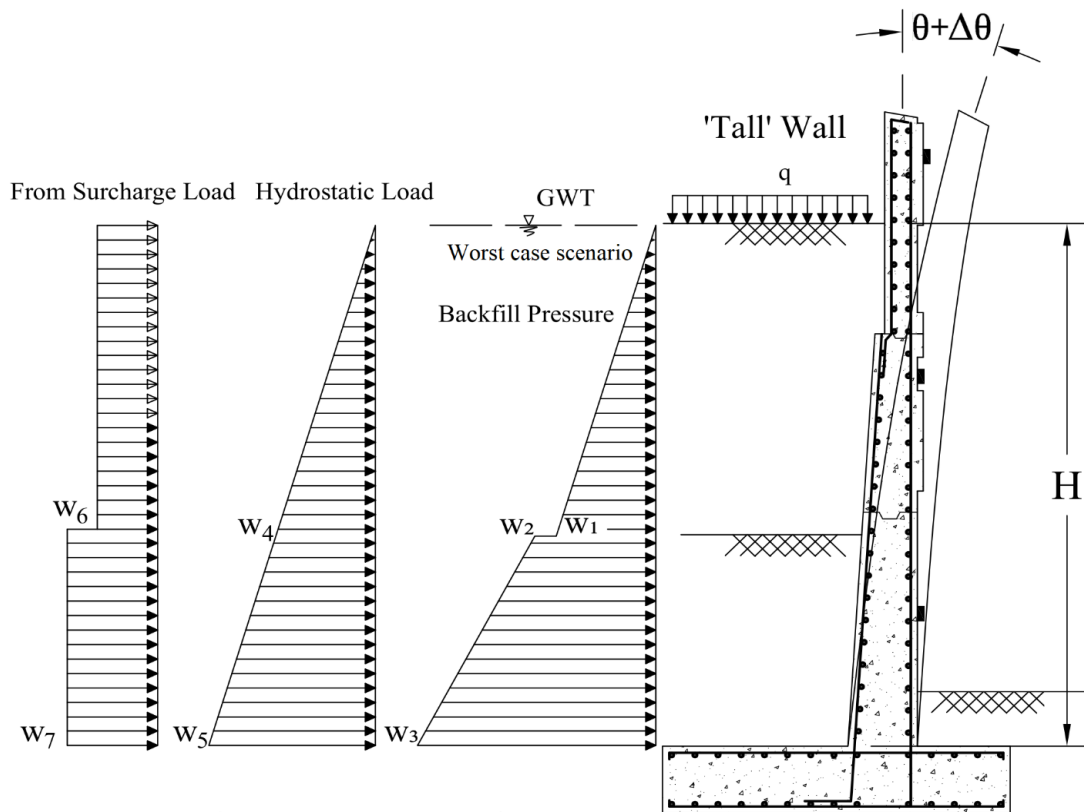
Cross-sectional view of the I-696 tall wall and its backfill lateral loads
